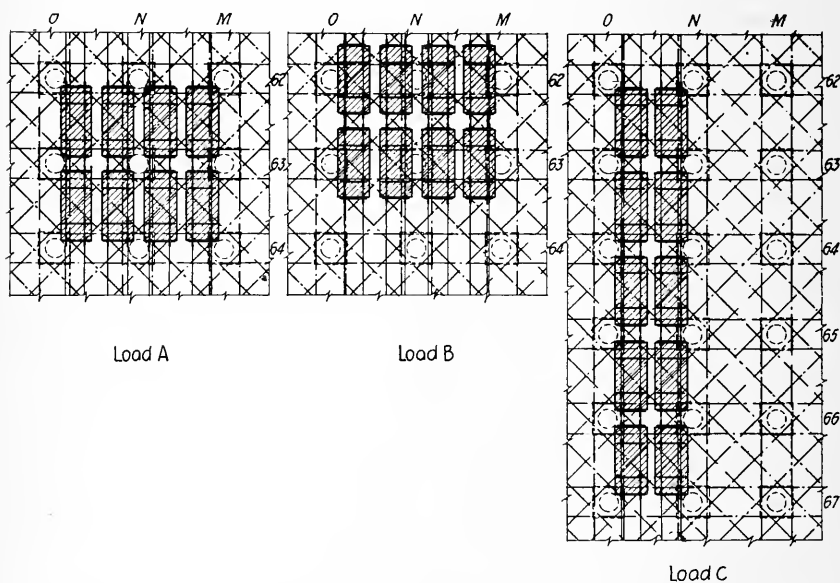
PLAN SHOWING POSITIONS OF CARS FOR LOADS A, B, AND C ON SOO TERMINAL TEST FLOOR.
